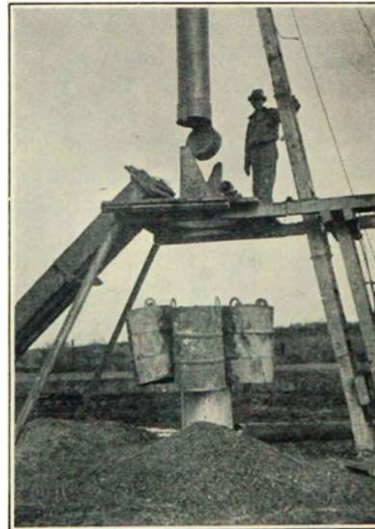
Detachable steel barrels used for loading casing. Fifteen-inch sand pump on drilling line. Note location of helper. Platform also carries drive head for auger.
